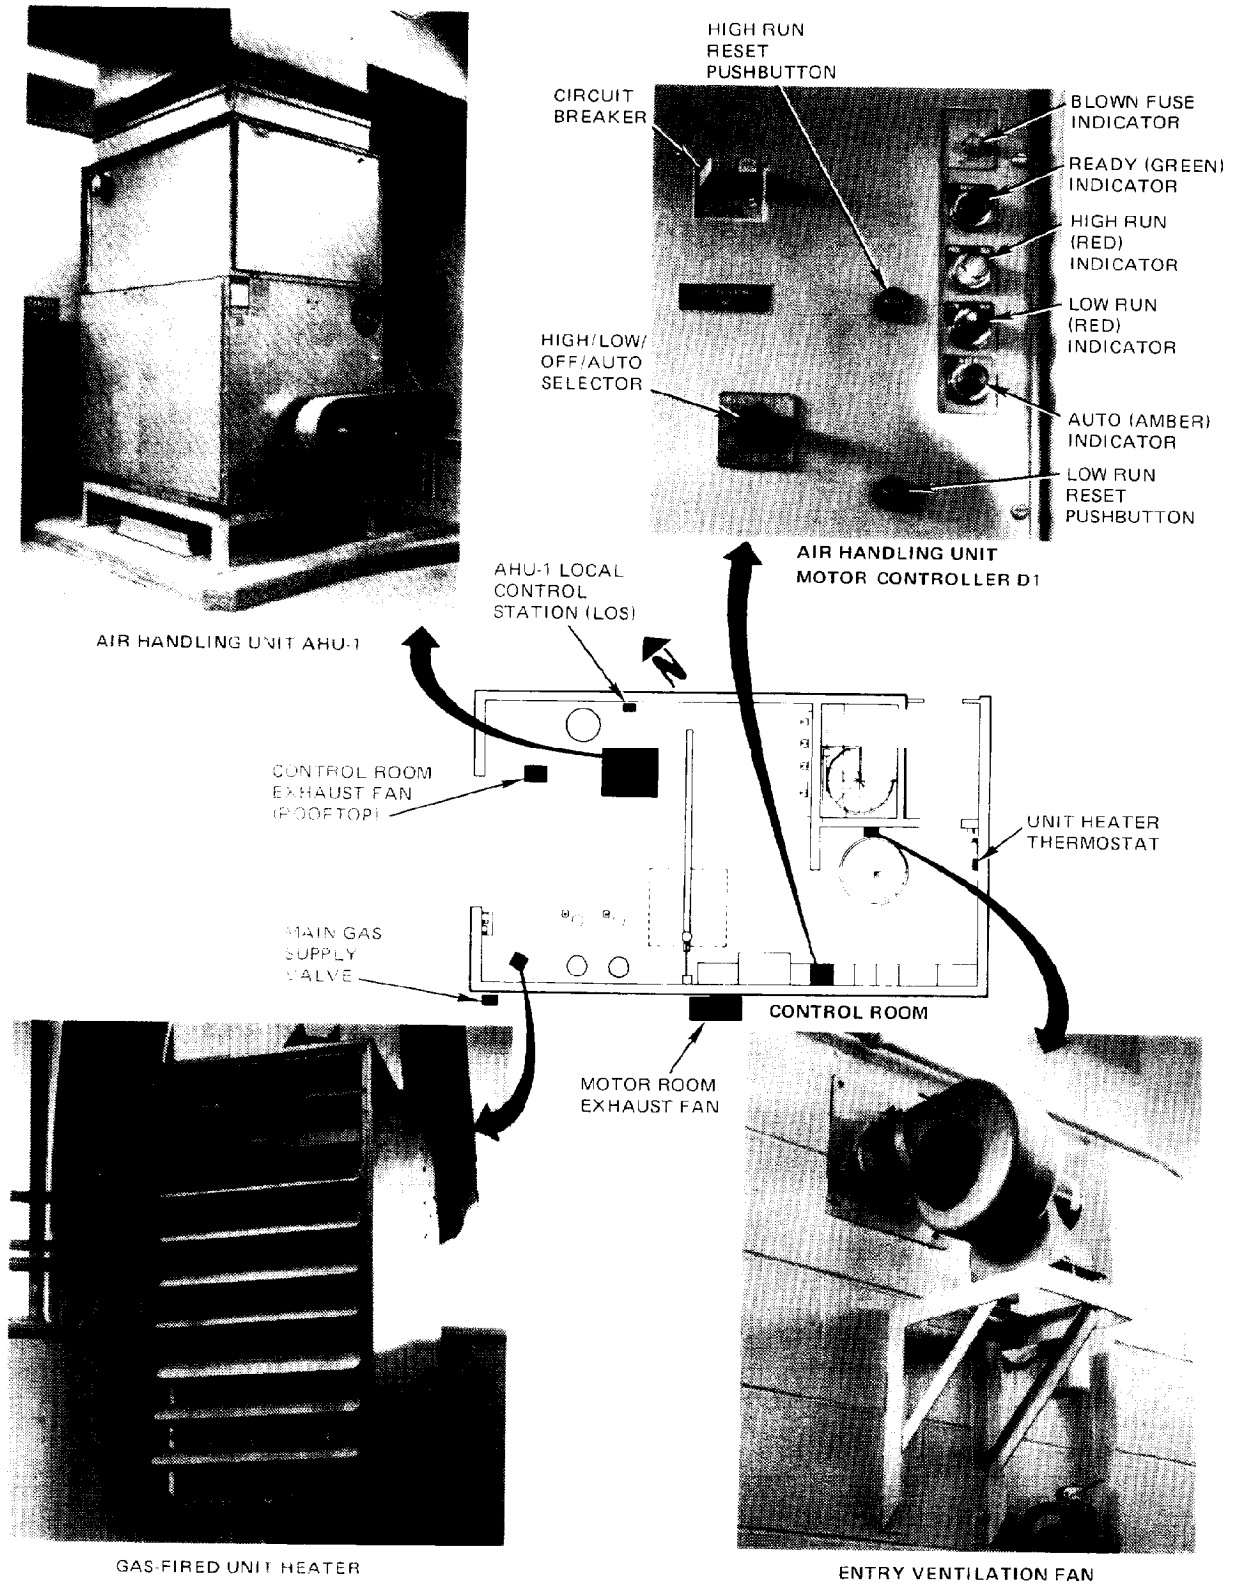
Heating and Ventilation System Equipment (Sheet 2 of 2)
